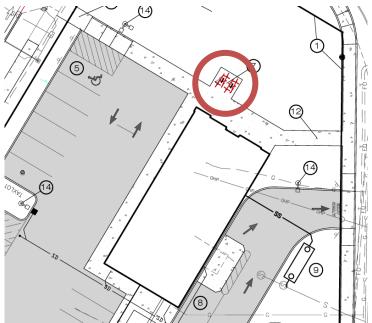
Applicant's site plan, proposed bicycle parking is circles in red
